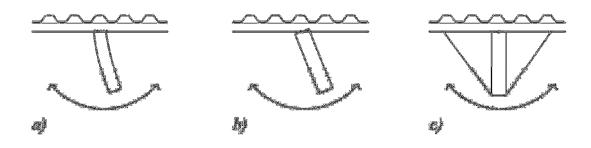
A primary beam in a roof structure rotating around its longitudinal axis due to negative bending: a) torsional rigidity being provided by the purlins and the roof cladding, b) the joint between the primary beam and the purlin being a pinned one, and c) torsional bracing of the cross section being provided by means of tension ties connected to the bottom side of the member.
